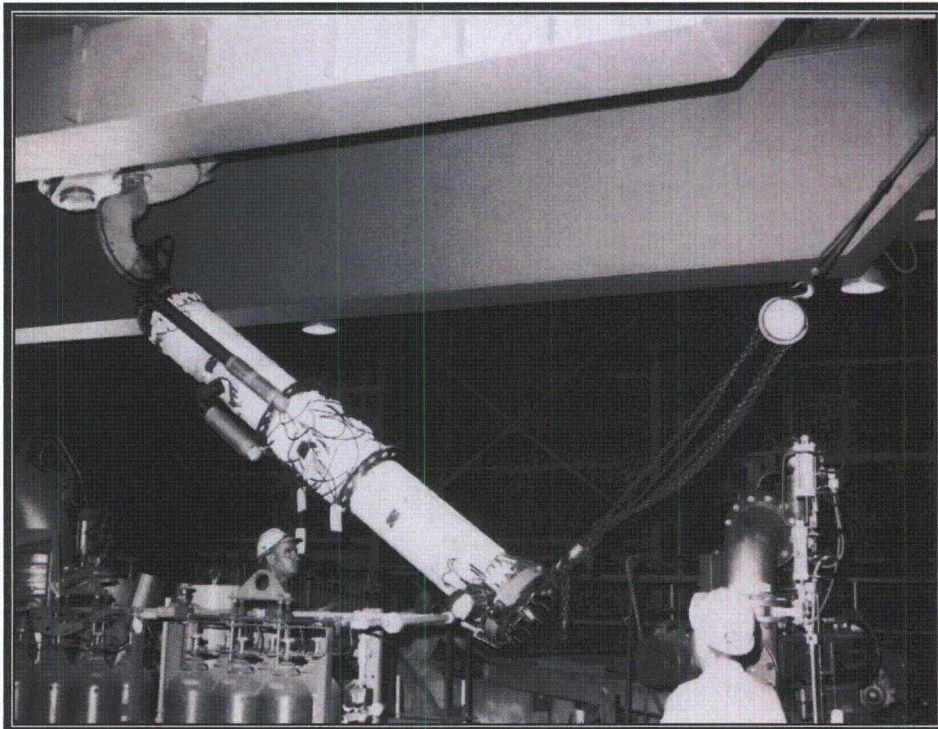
Construction photograph of installation of steam cleaning chamber (Courtesy DECo)
